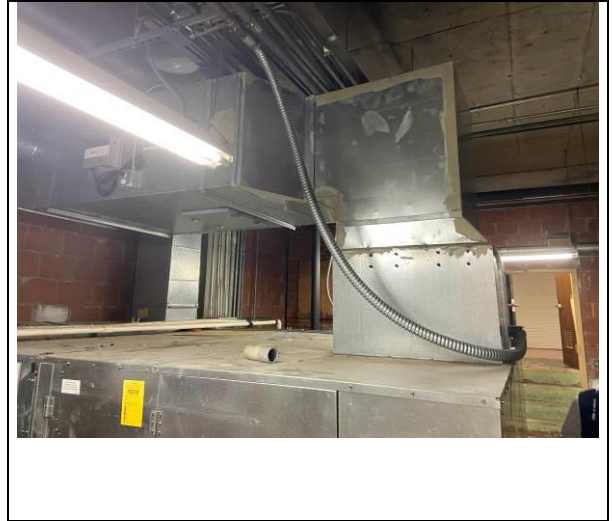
View of assumed HVAC mud on HVAC equipment in exterior HVAC room.
